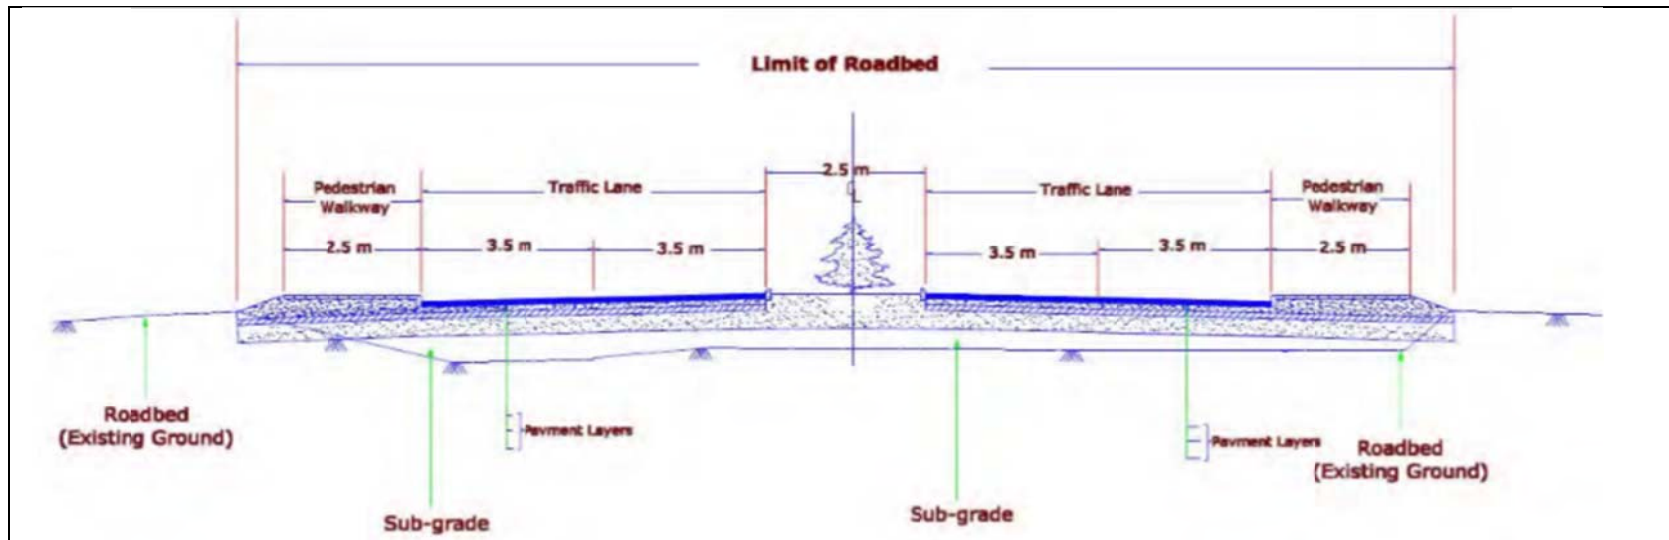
Divided Two Lane (Zonal Seat) Typical Town Section
